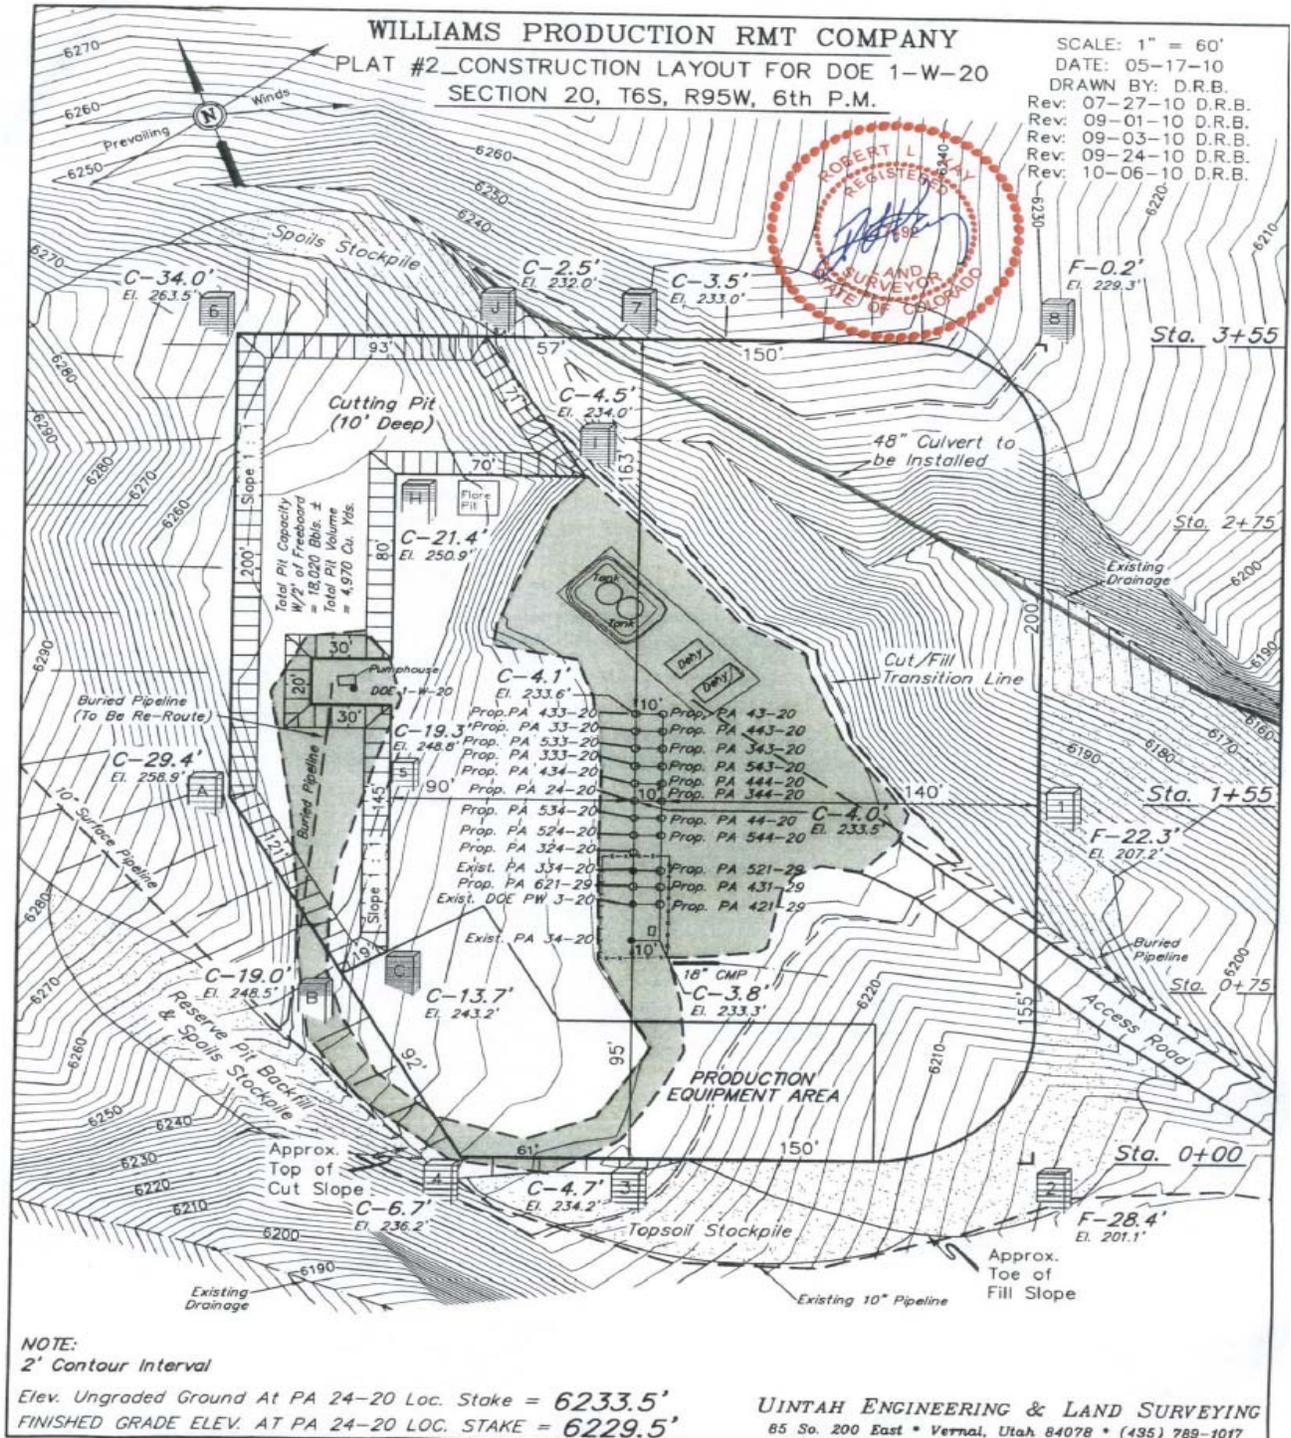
Construction Layout for DOE 1-W-20 Pad Expansion
